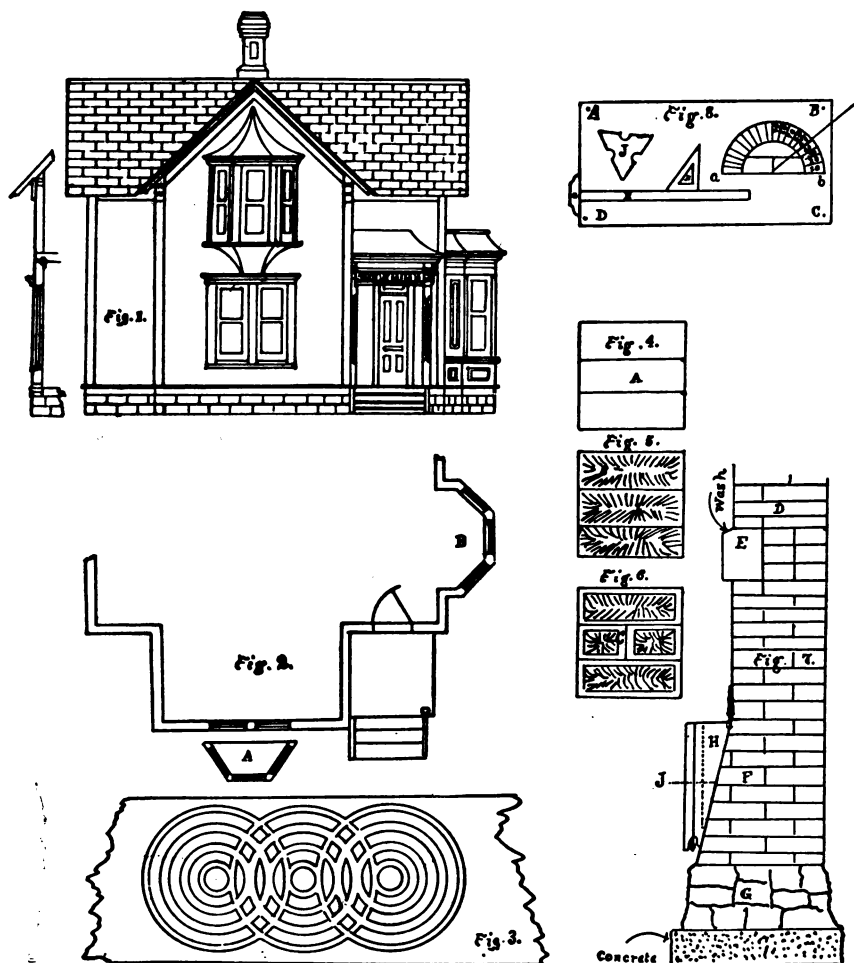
, 5, 6 and 7 are stone and brick details. A would be point face or sawed stone; B, pitch face range; C, pitch faced tool margin; D, brick wall; E, stone water table cut with a wash; F, battered brick wall; G, a plain rubble wall of stone.
